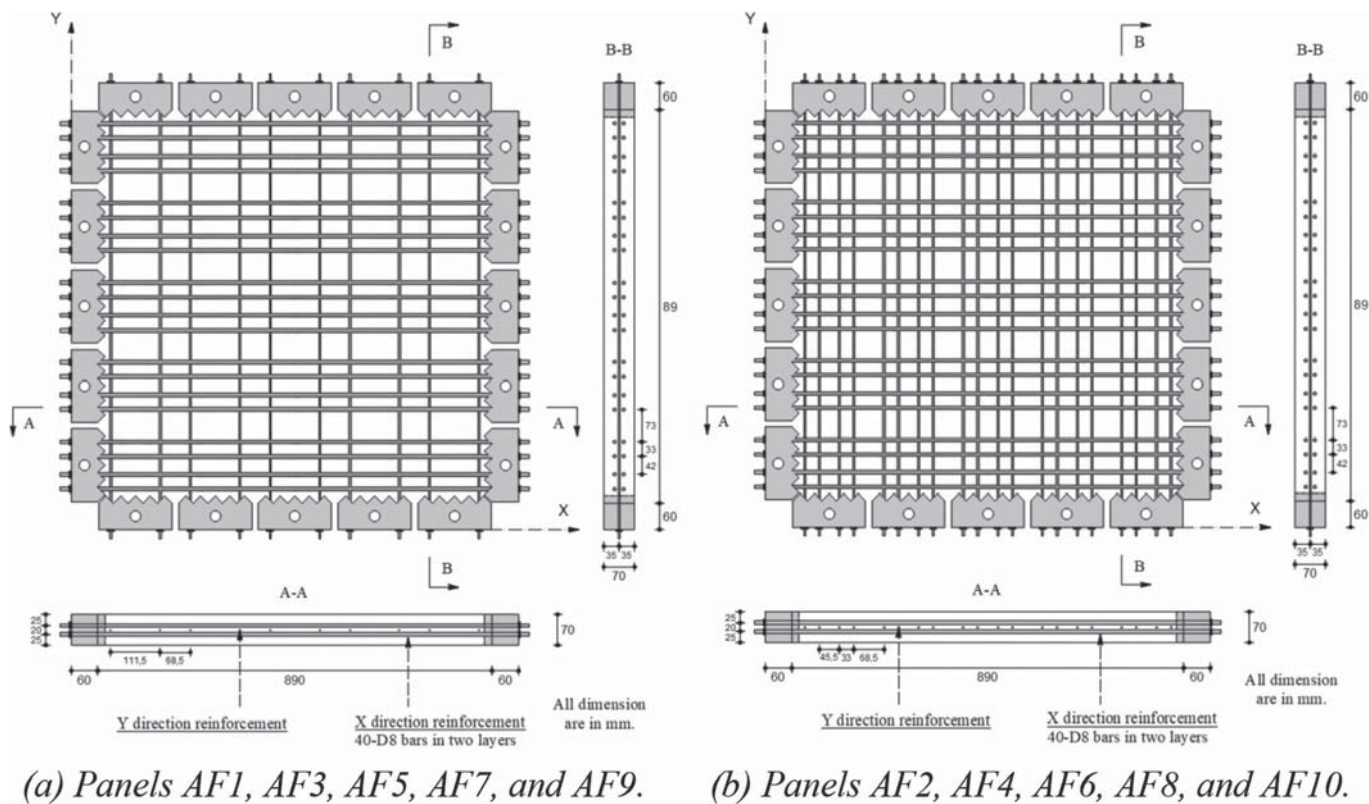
Typical reinforcement configuration. (Note: 1 mm = 0.0394 in.)
